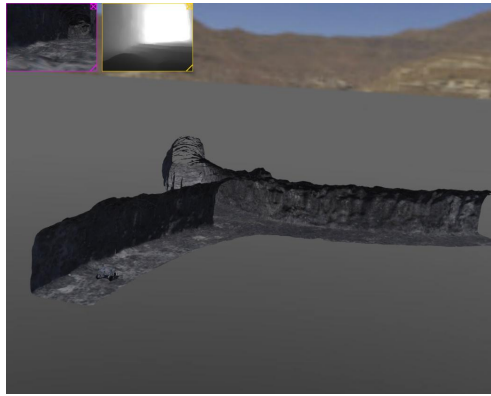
1:1 scale model of a T-section of underground tunnel of partner mining company
